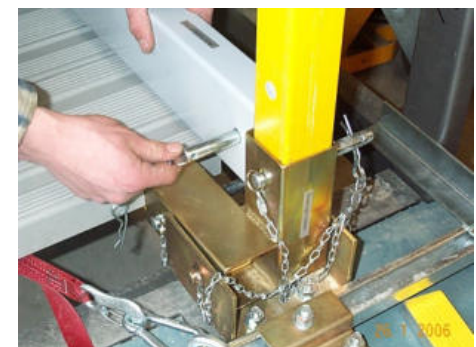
Using a long locking pin to mount the rear, right-hand toeboard
